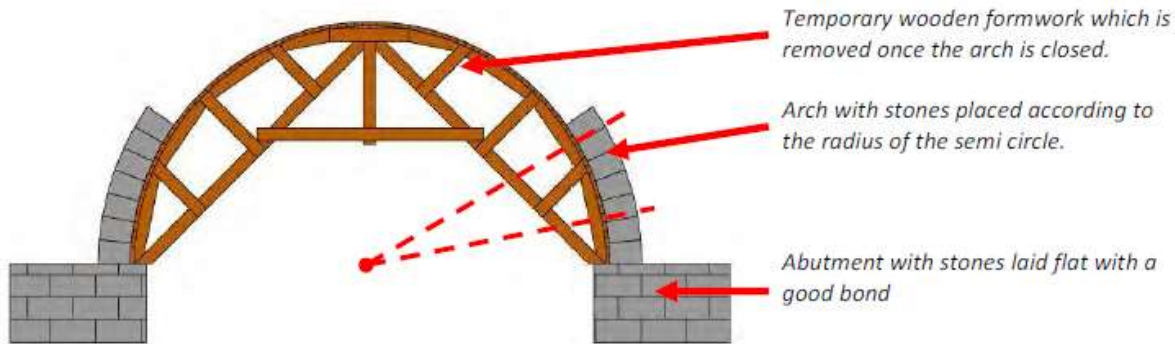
Basic elements of arch bridge construction. The arch is constructed symmetrically over a temporary formwork. Note that the arrangement of the stones differs entirely between the arch and the abutment. Stones of
